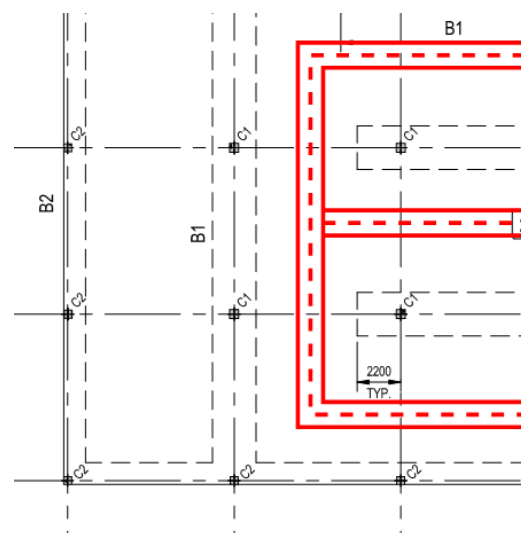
Ducting allowance within ceiling space achieved via terminating bands.
